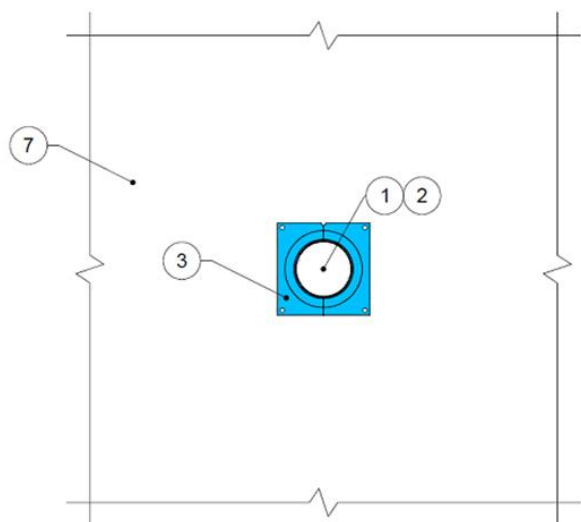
Plastic pipe with PROMASEAL® FC 40 – 150 collars (floor underside plan view)
